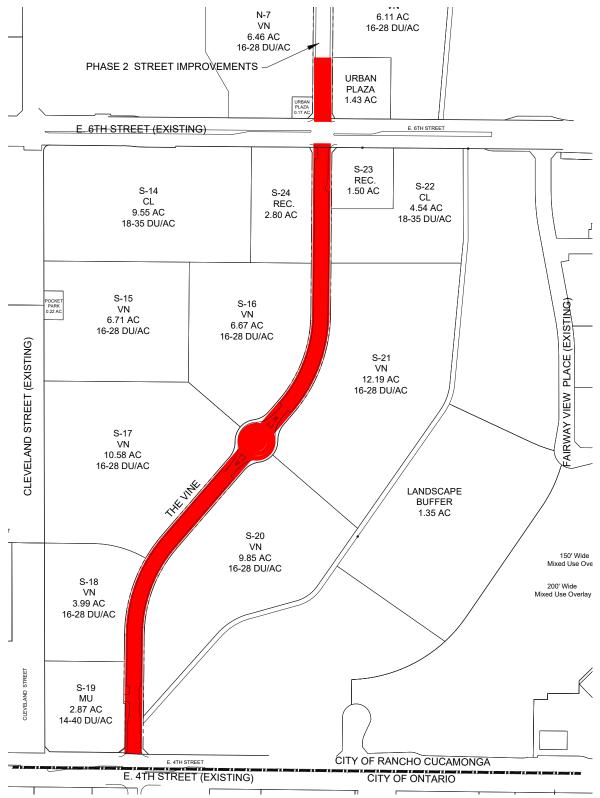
Conceptual Phase 1 Street Improvement Facilities Plan
